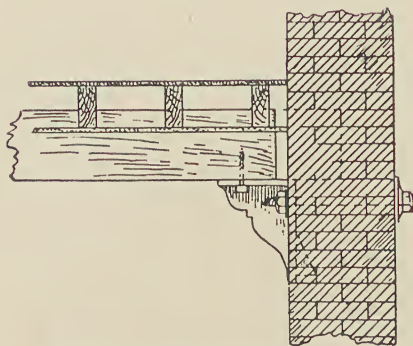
Bracket to support End of Beam, with decayed part cut away
